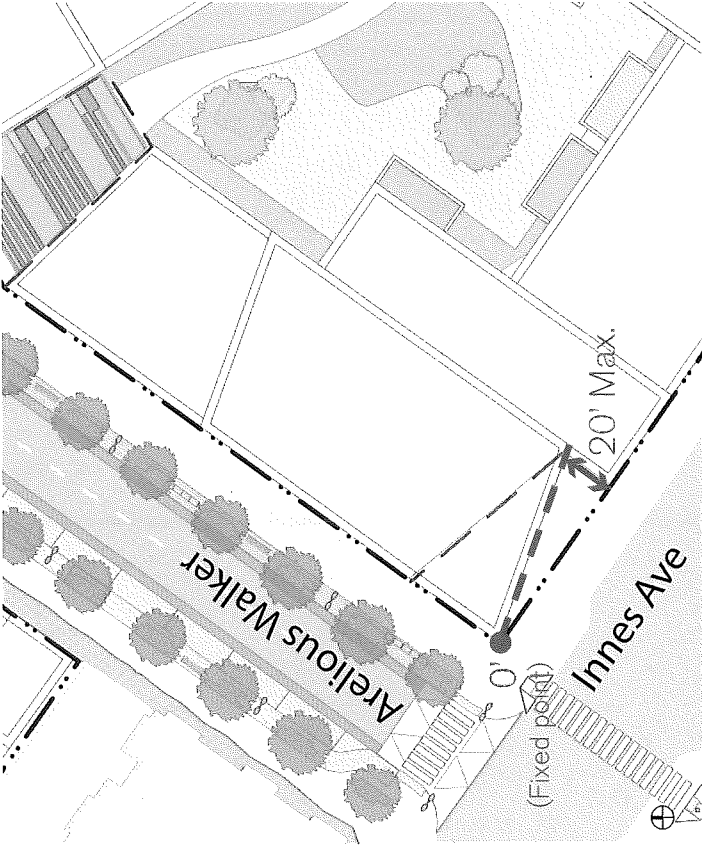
Unique Setback at Transit Plaza Tower - Plan
